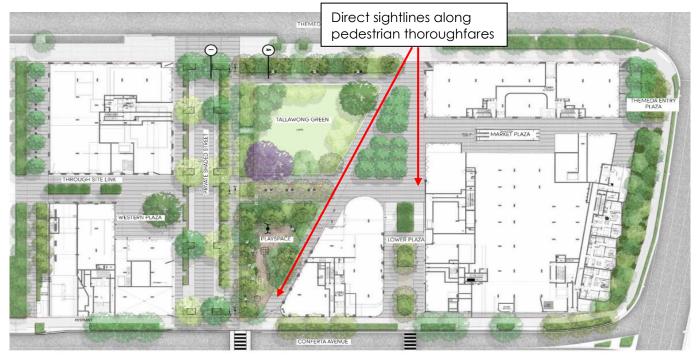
Extract from Landscape Plan - Stage 1 Masterplan
